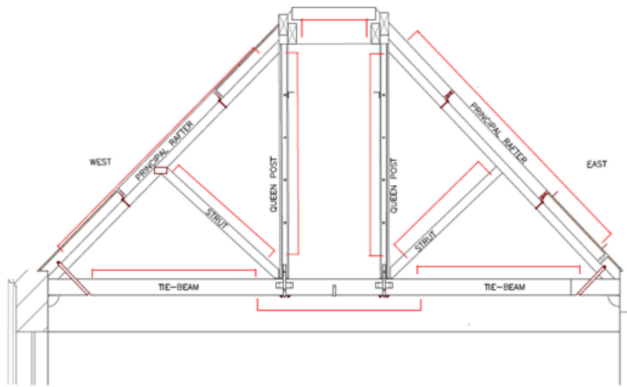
Queen truss with position of ToF measurements carried out marked in red
